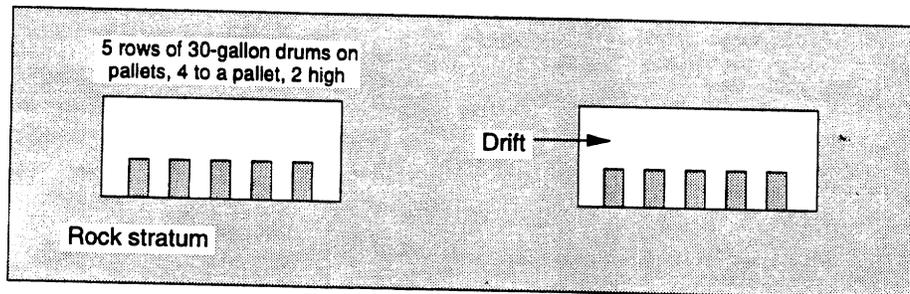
Elevation View of Mined Cavity Showing Storage Configurations
